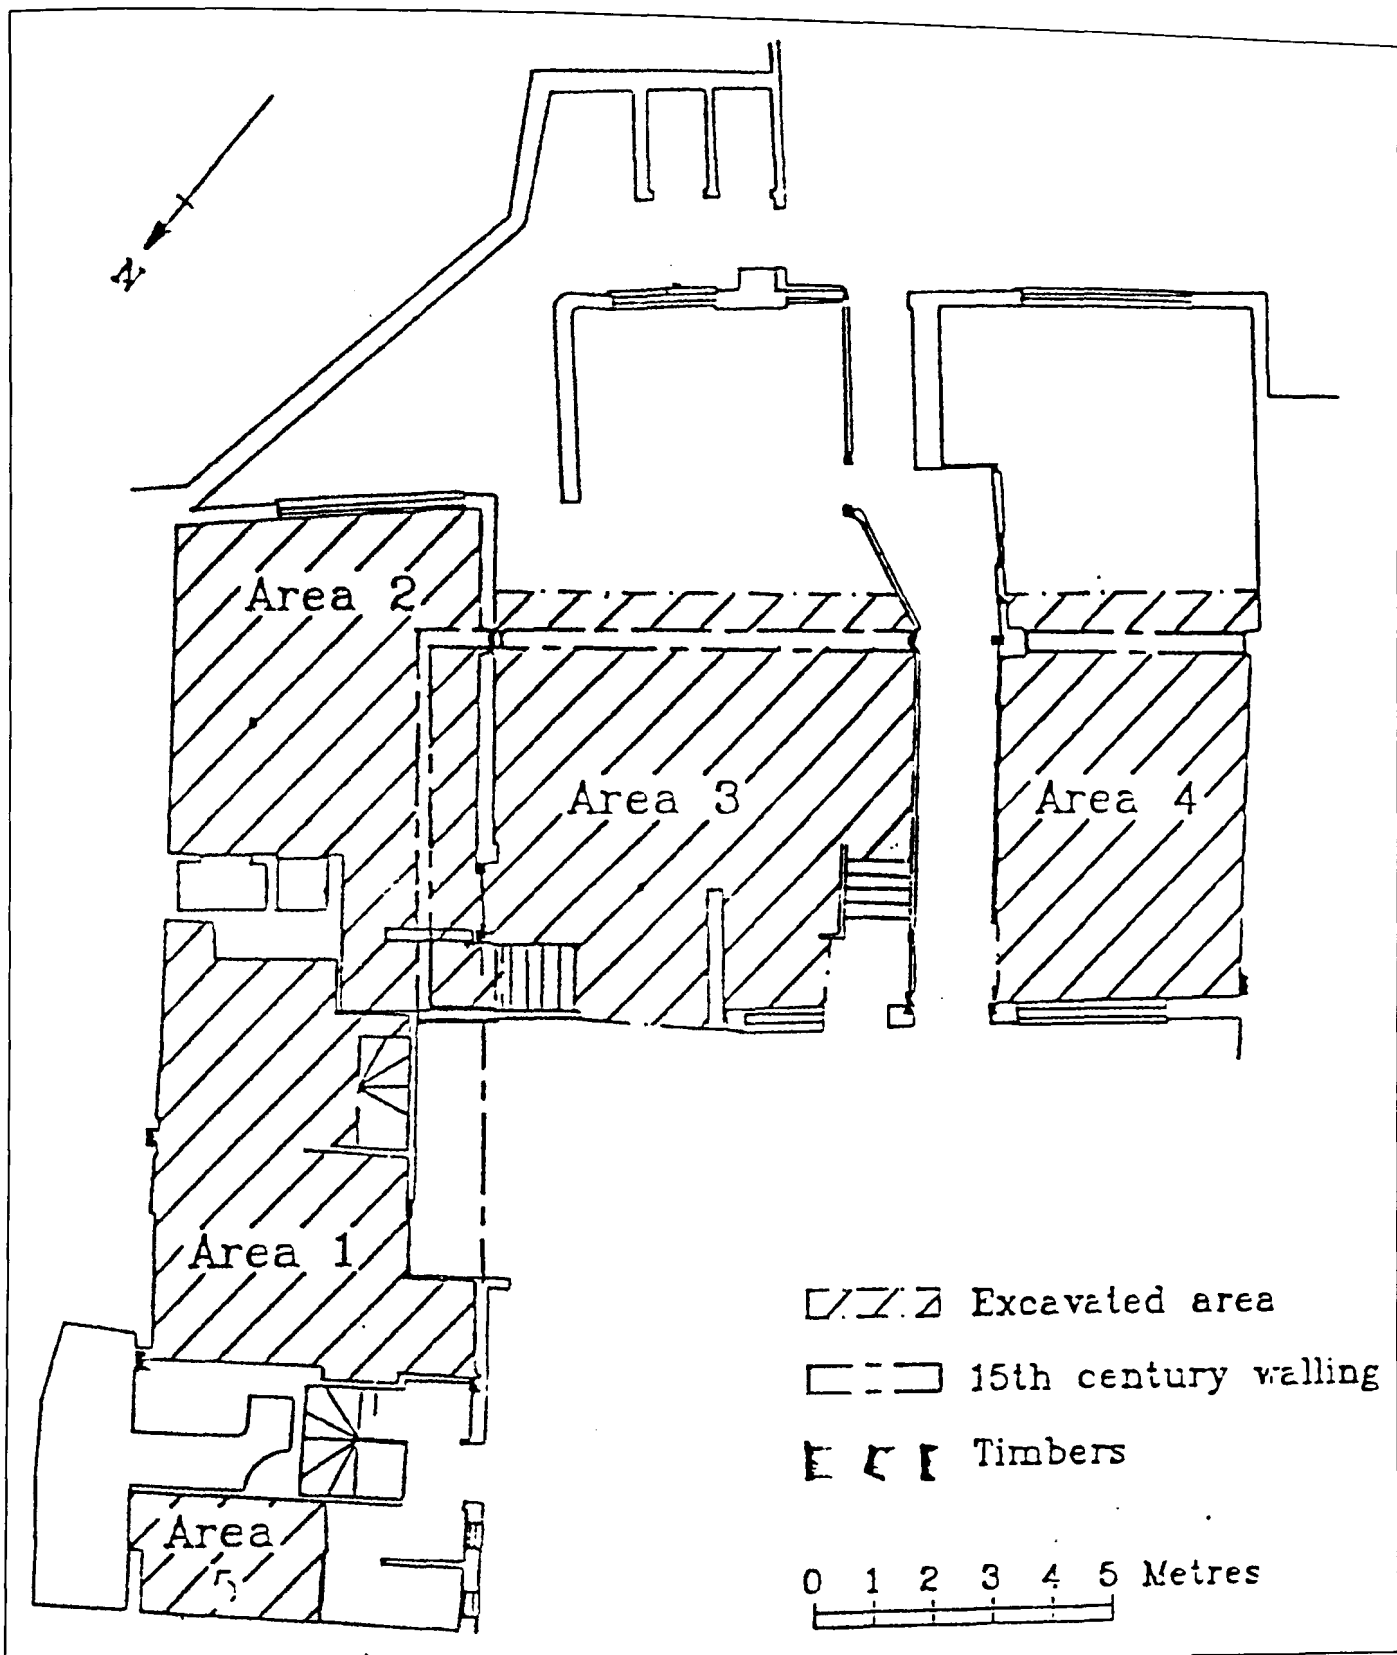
A plan of the designated excavation areas located within the Coffee Yard building complex. The focus of study in this thesis is Areas 1 and 2, located within the older range of the house, originally used as a Prebendal hospice (provided by the York Archaeological Trust).
